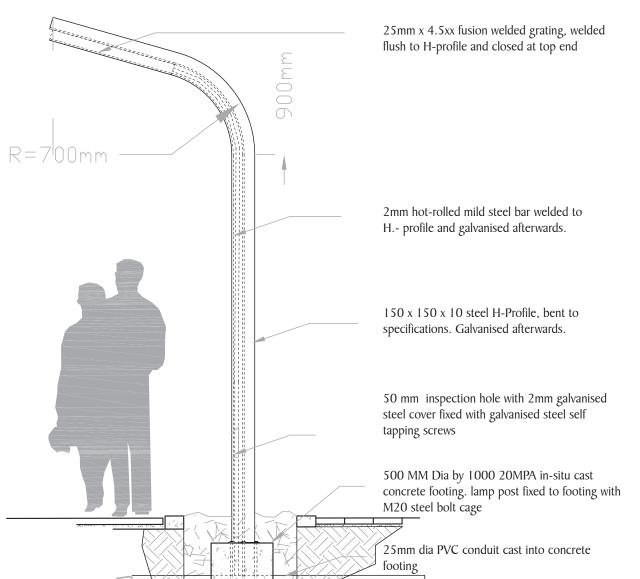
LAMP POST Section Scale 1:25 (Author, 2008)
